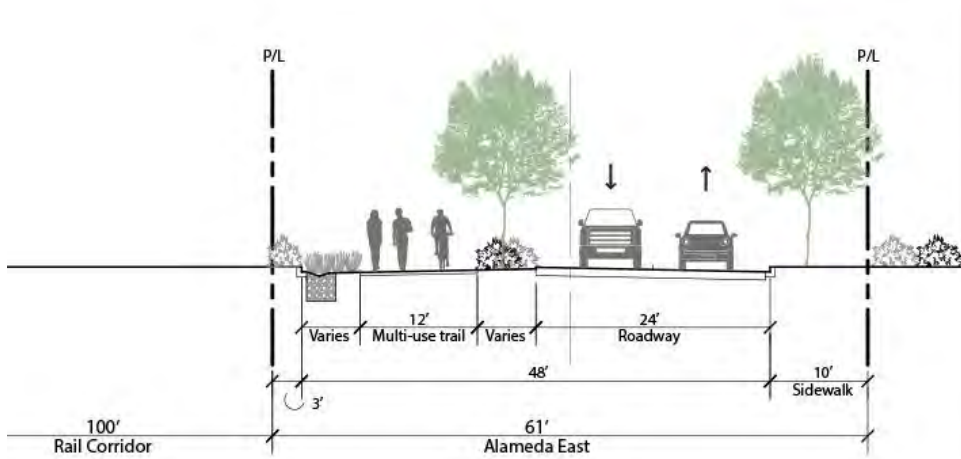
Alameda East Greenway Typical Cross-Section (Reduced Greenway Alternative).
